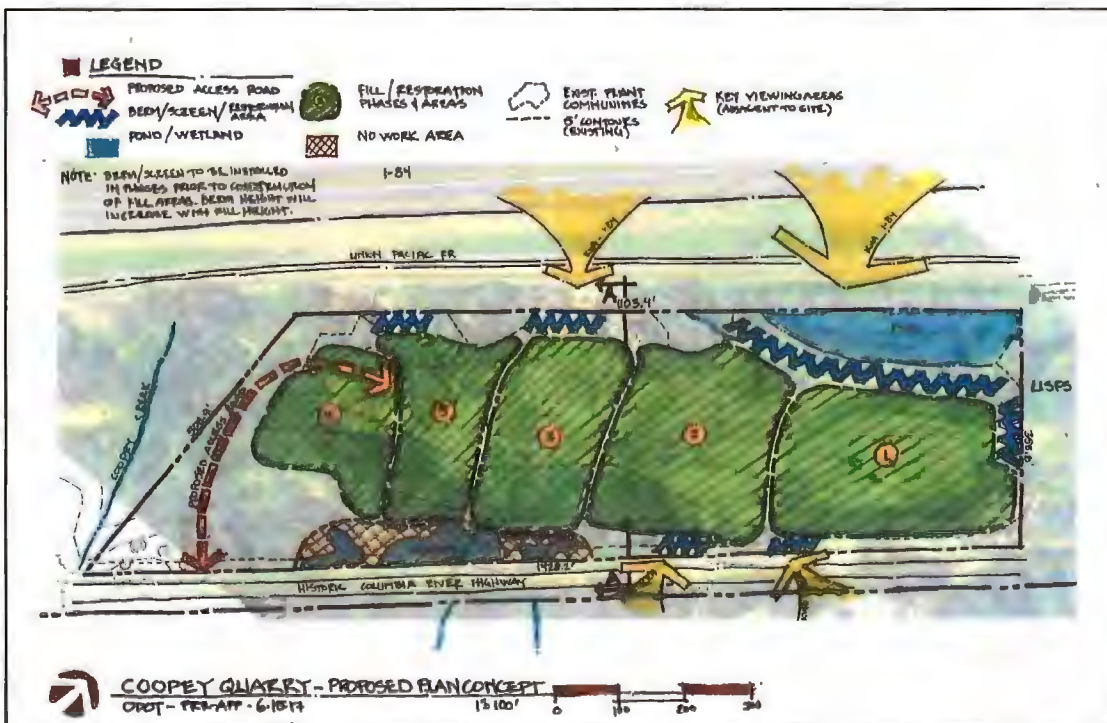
Proposed Plan Concept at Cooley Quarry showing location for the access road at west end of the quarry.
